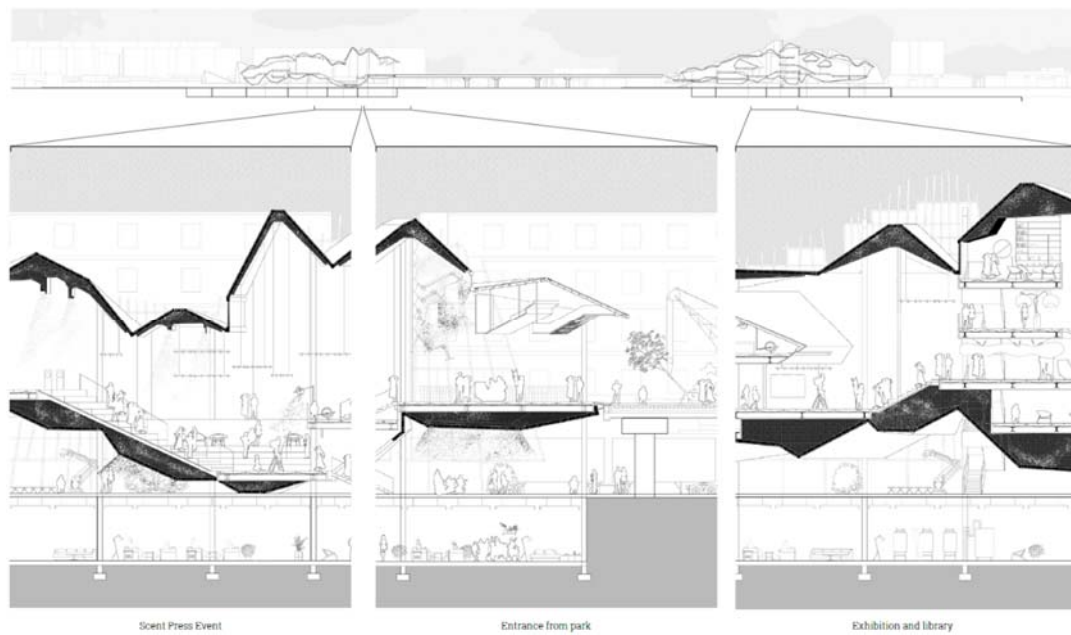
South-facing section of the building (Image source: author's own drawing)
